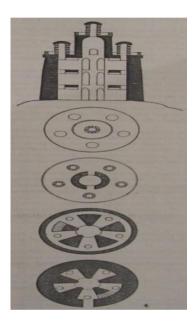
Plan and section of Ateshg □h at Isfahan²⁹
